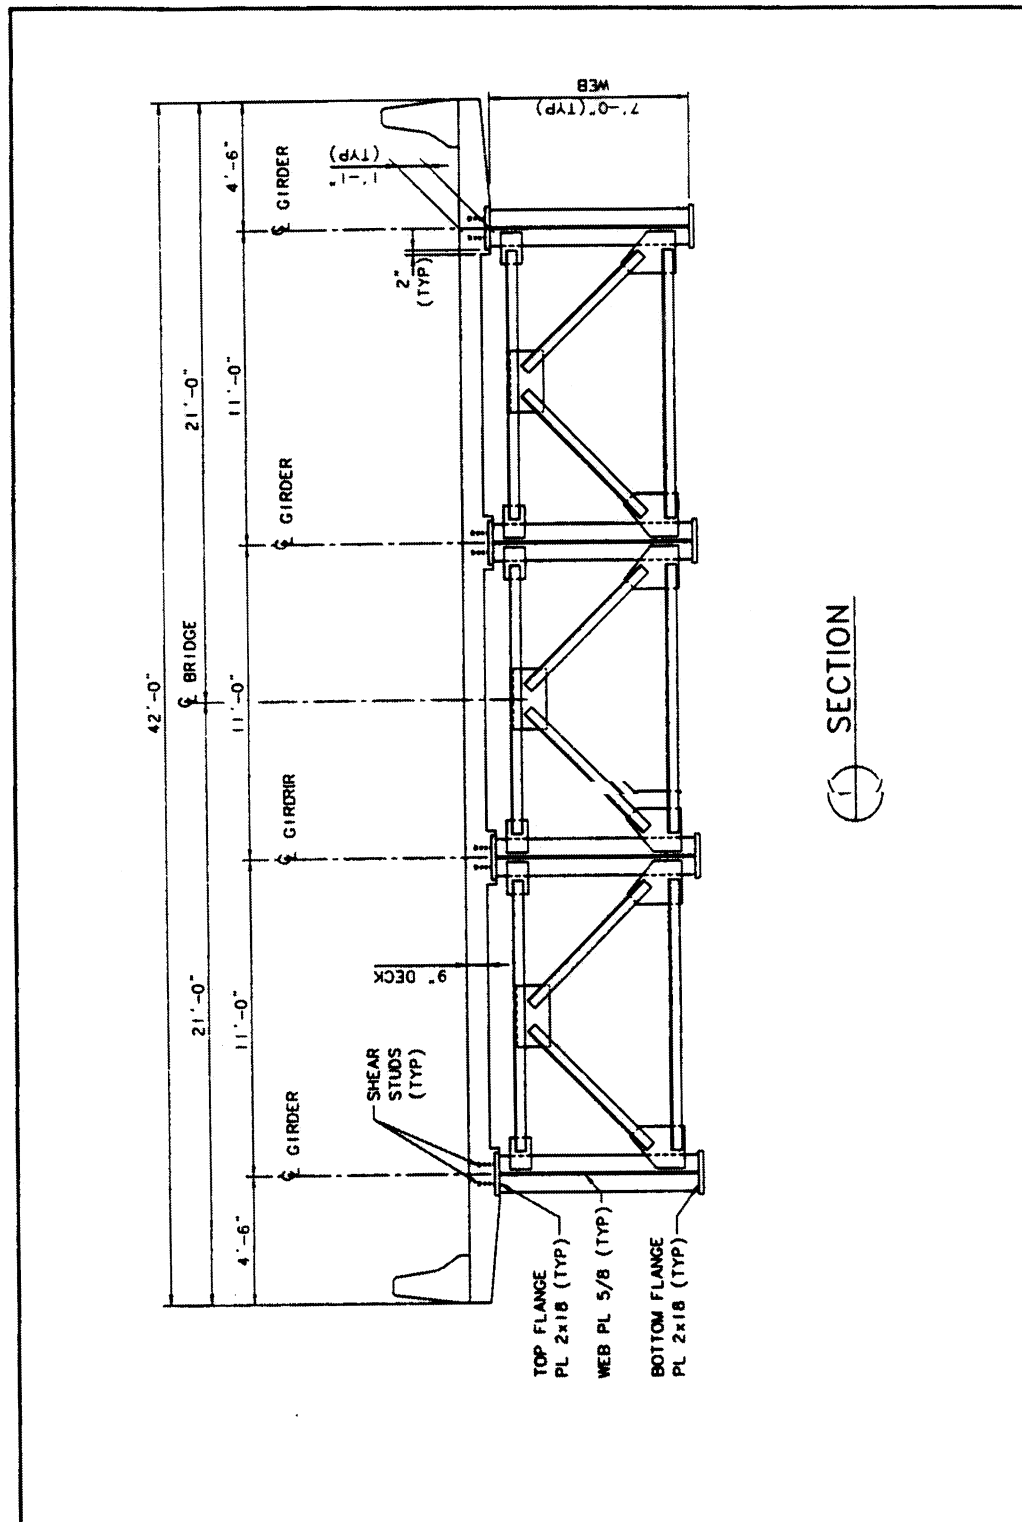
Bridge No. 5 – Typical Cross-section
